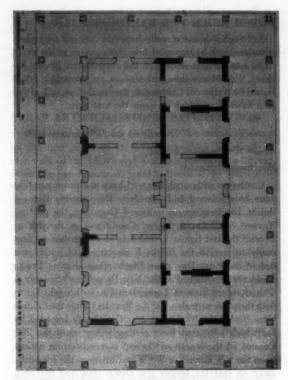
Plan of "Versailles," reconstruction. (Author)
